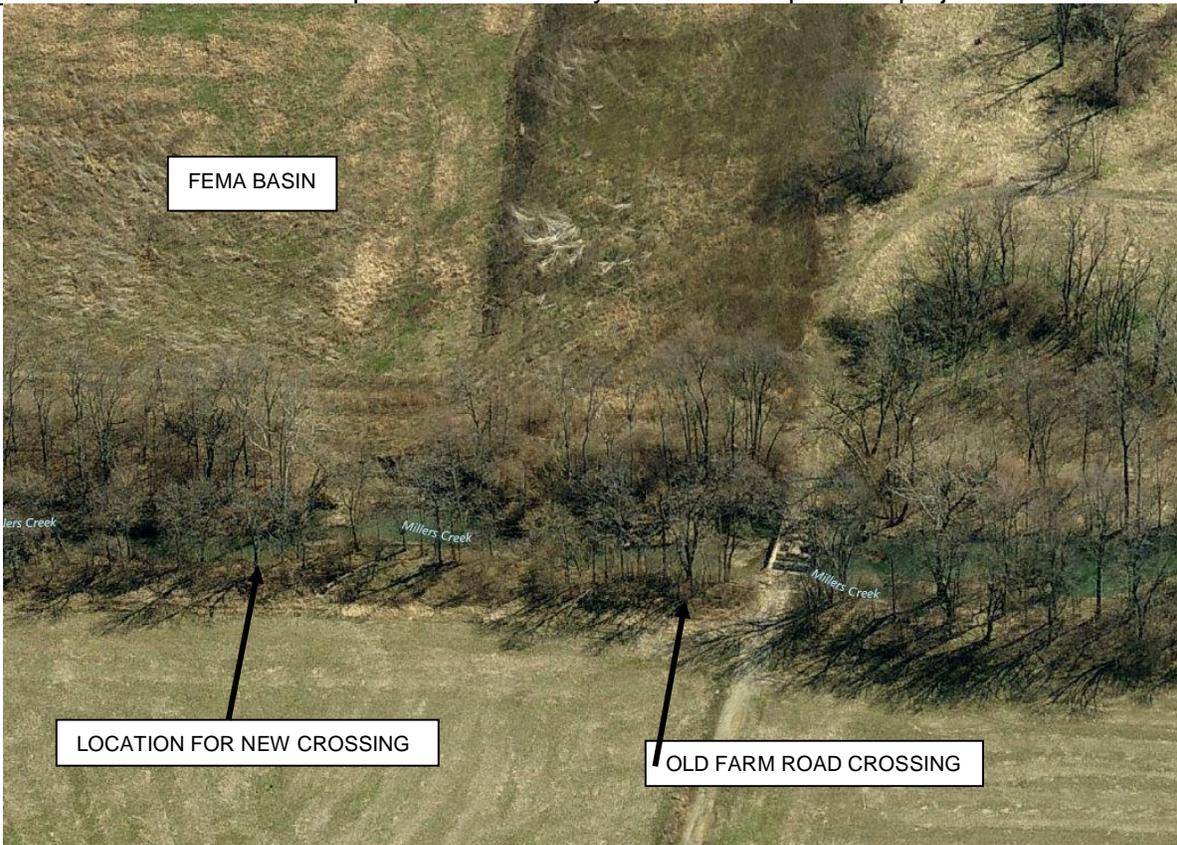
Aerial photograph showing the old farm road crossing in Millers Creek that will be removed as part of the Gateway Boulevard Expansion project.
